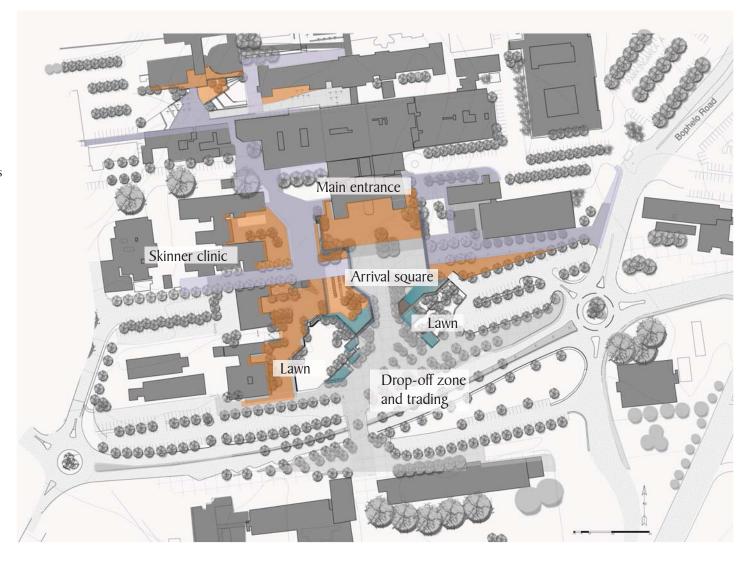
Sketch plan - paving and materials (Author, 2008)
